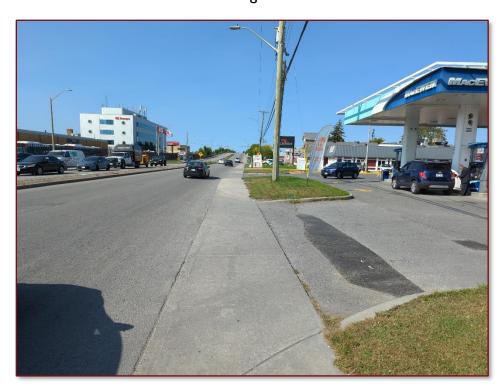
St. Laurent Boulevard - Artificial Slope and Paved Roadway
